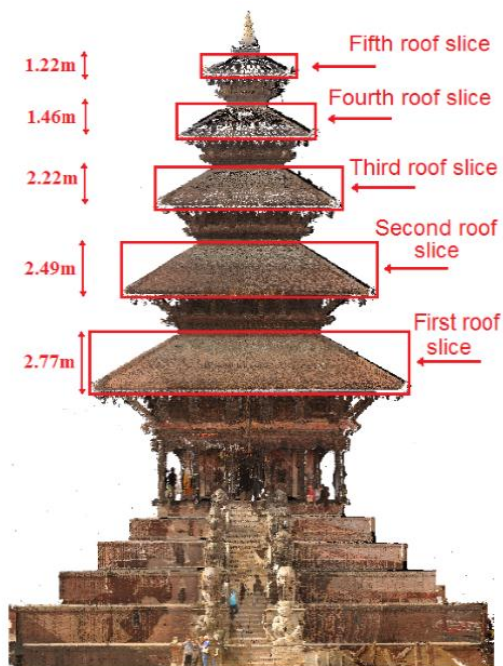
Elevation view highlight location and thickness of the point cloud slices for roof sections.
